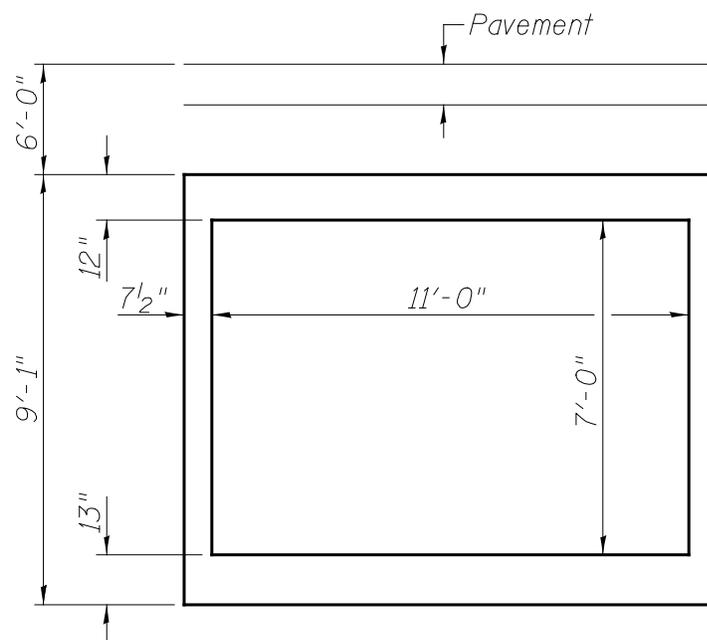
Worked Example 4 & 5 – Culvert Cross Section
